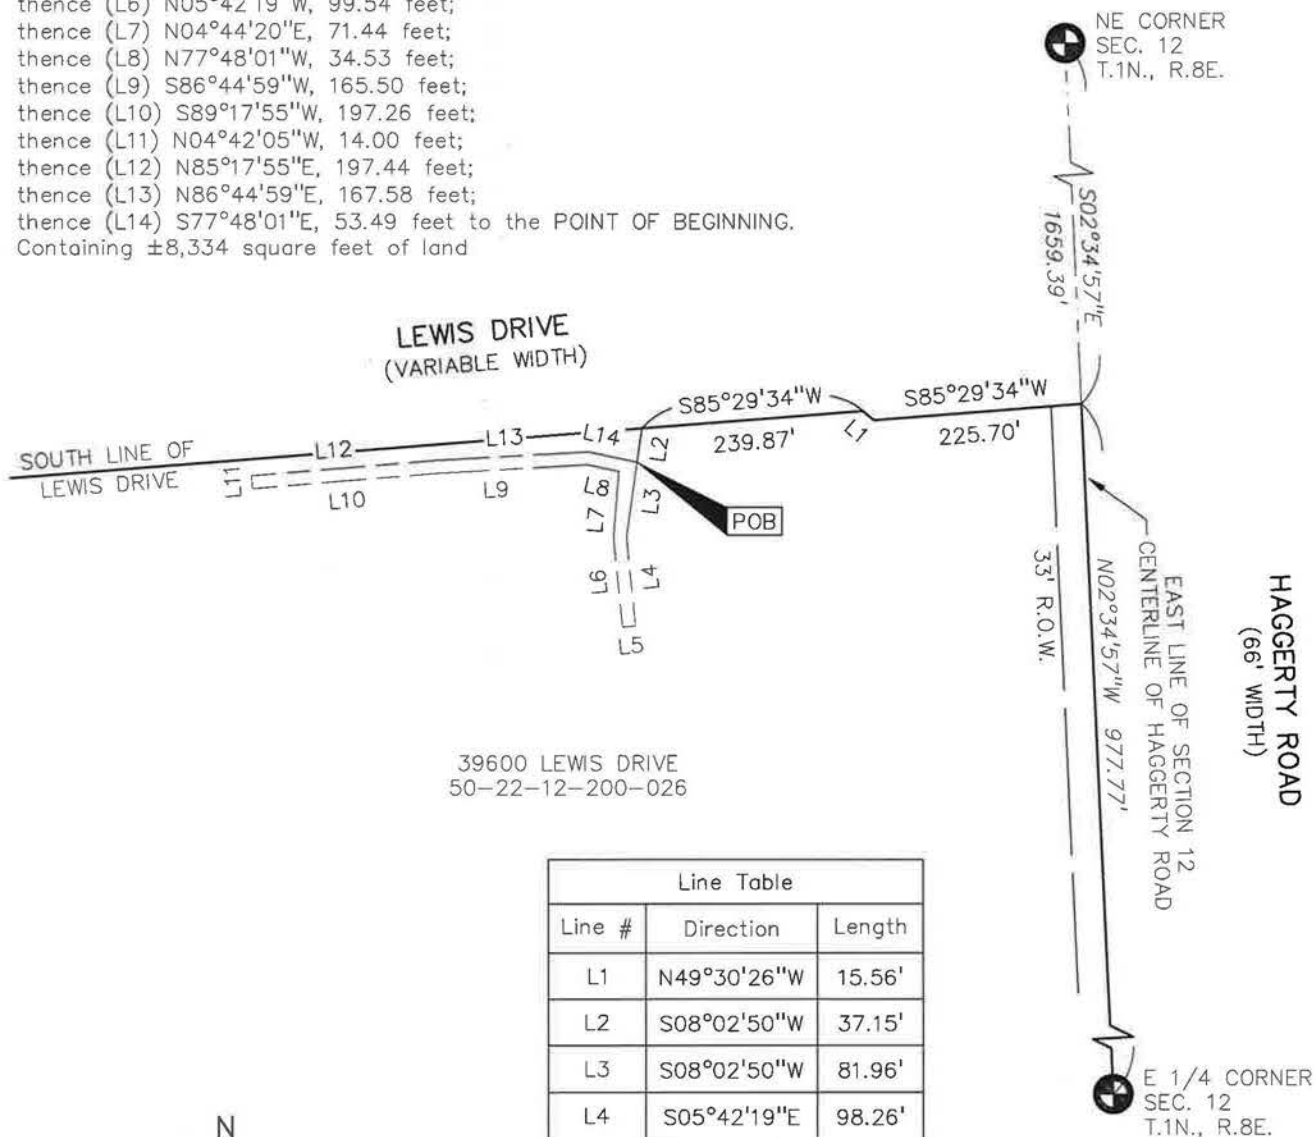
EXHIBIT B SKETCH OF PROPOSED CONSERVATION EASEMENT NO. 2
